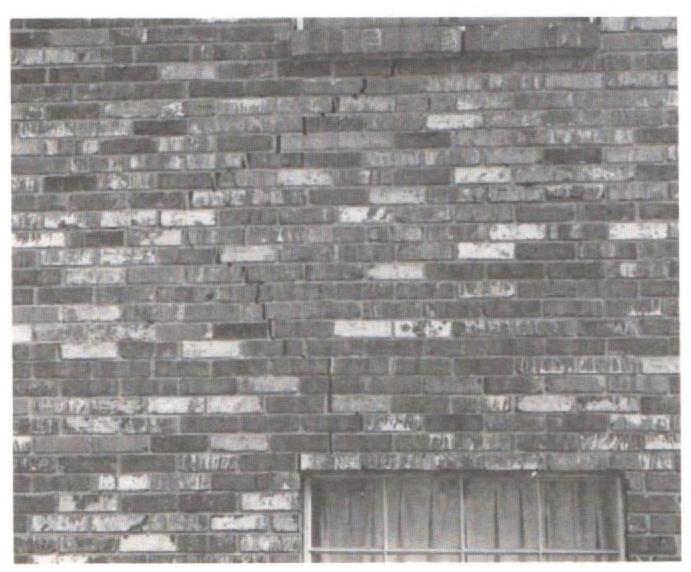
Apartment building wall, first and second levels, with horizontal displacement.
